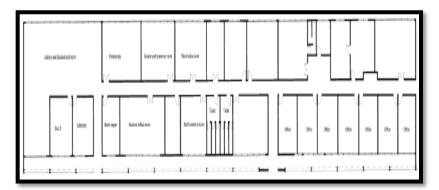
Ground Floor Plan Nursing Department. Source: Author's sketch, 2016
